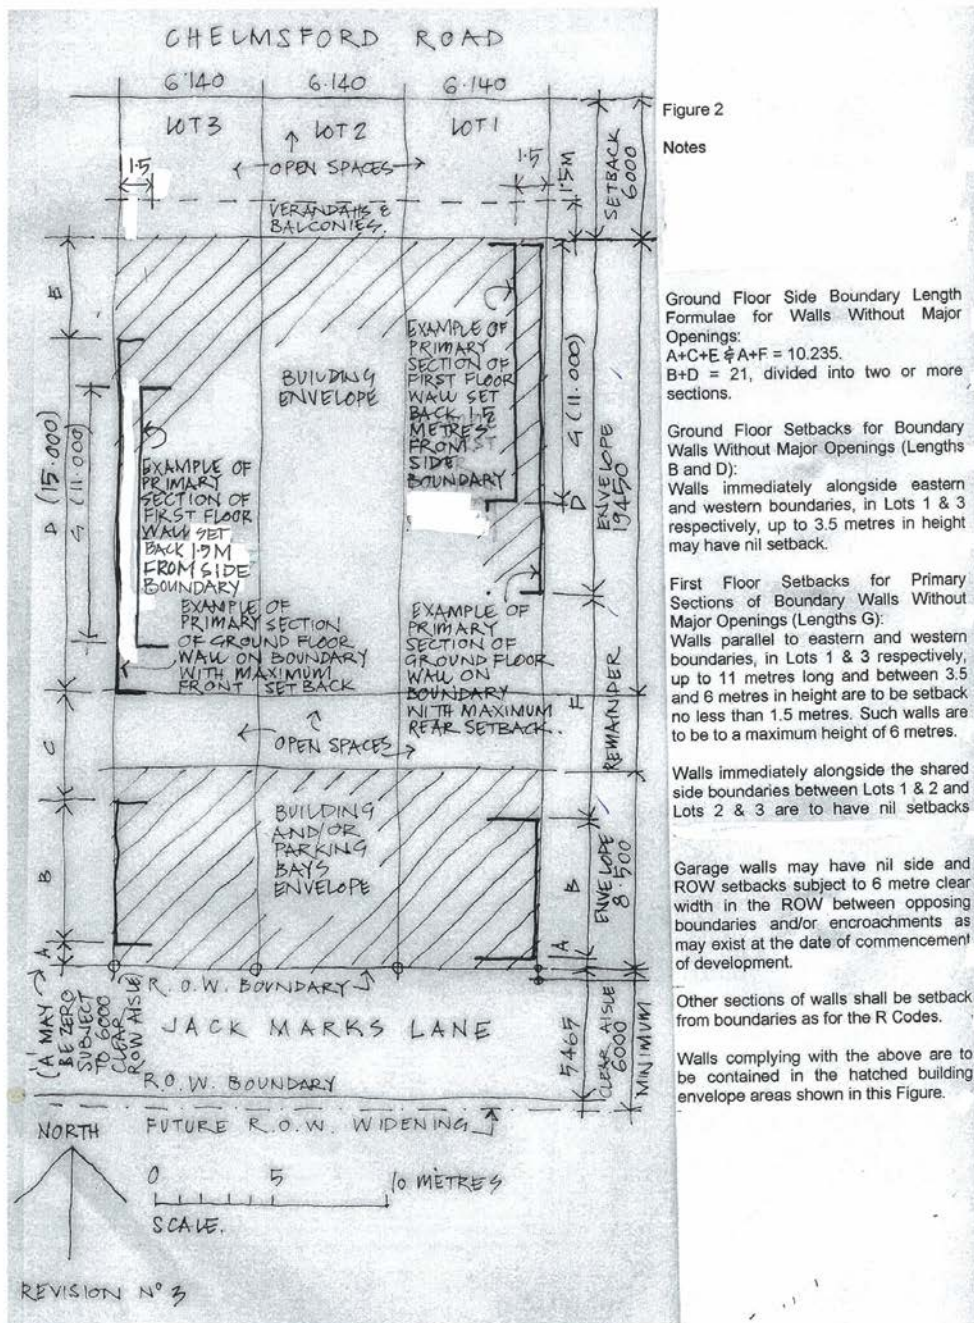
Diagrammatic Subdivision Plan of the Subject Land with Building Envelopes and Setbacks.
